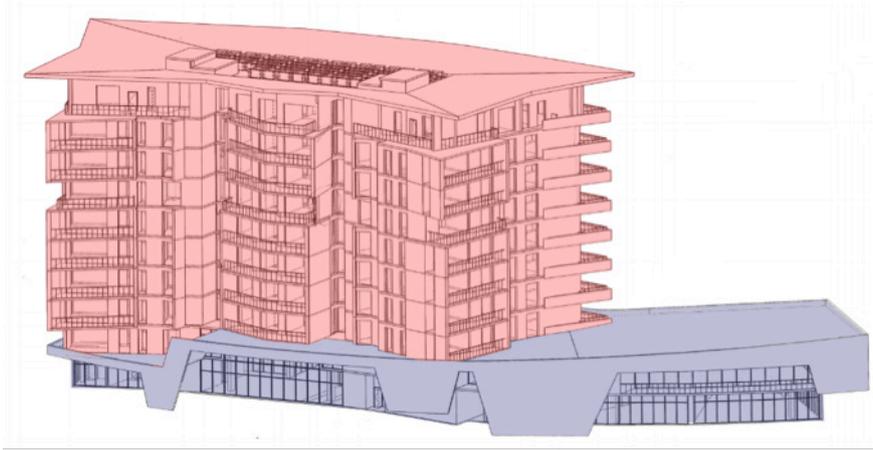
3D sketch of the structure. Concrete podium is shown in blue, CLT structure in red.
